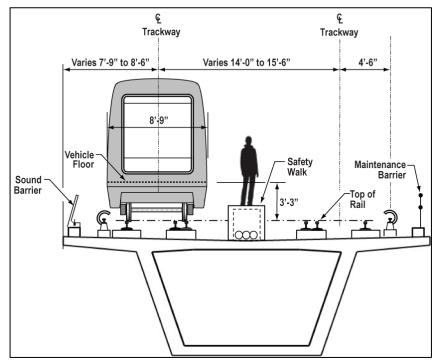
Example of LRT Vehicle on Elevated Guideway (Cross-Section)
